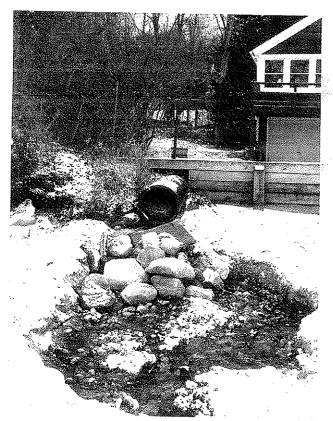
Potential site for rain garden on undeveloped tract of land at the corner of King and Locks Pond Road. (DCR/DWSP)
